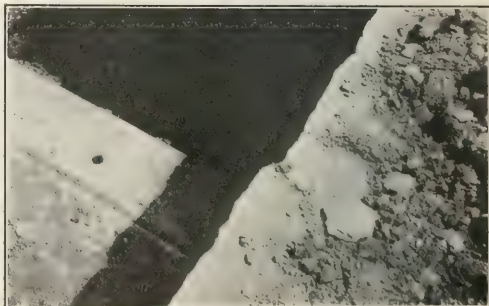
POINT AT WHICH DRILL ENTERED CONDUIT
